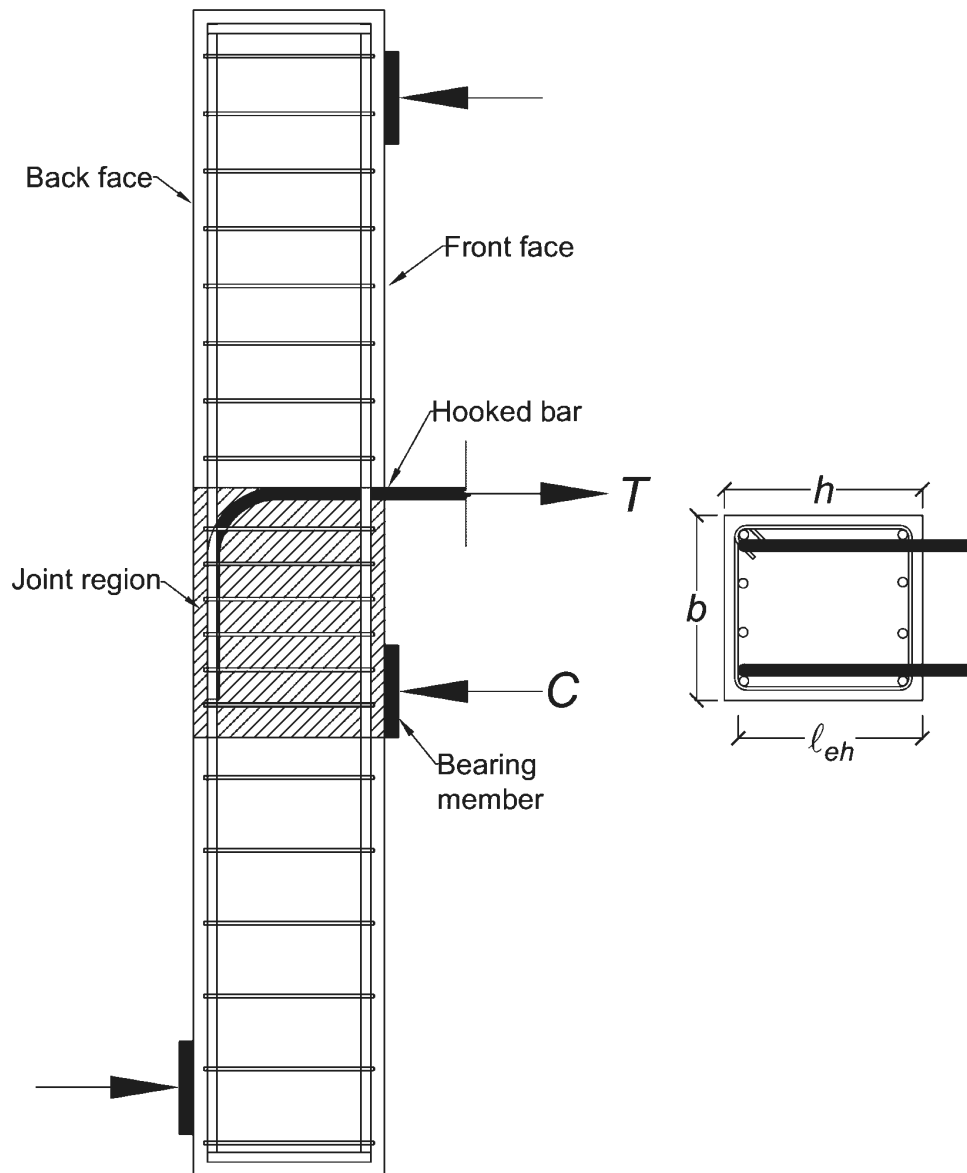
Schematic of the specimens with hooked bars, side view (left) and top view (right)
